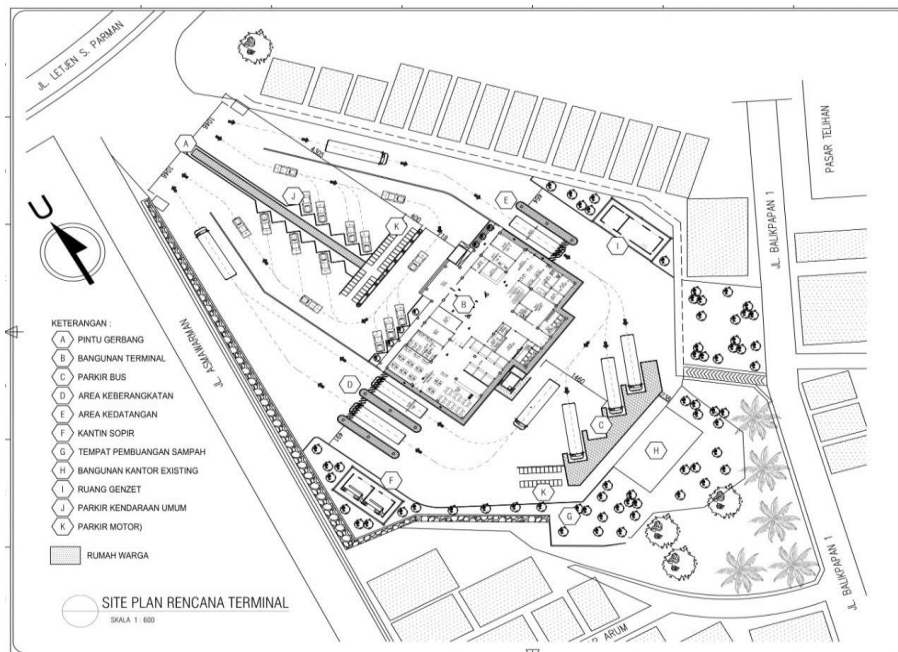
Site Plan for the Development and Operational Plan of Bontang Type B Terminal
